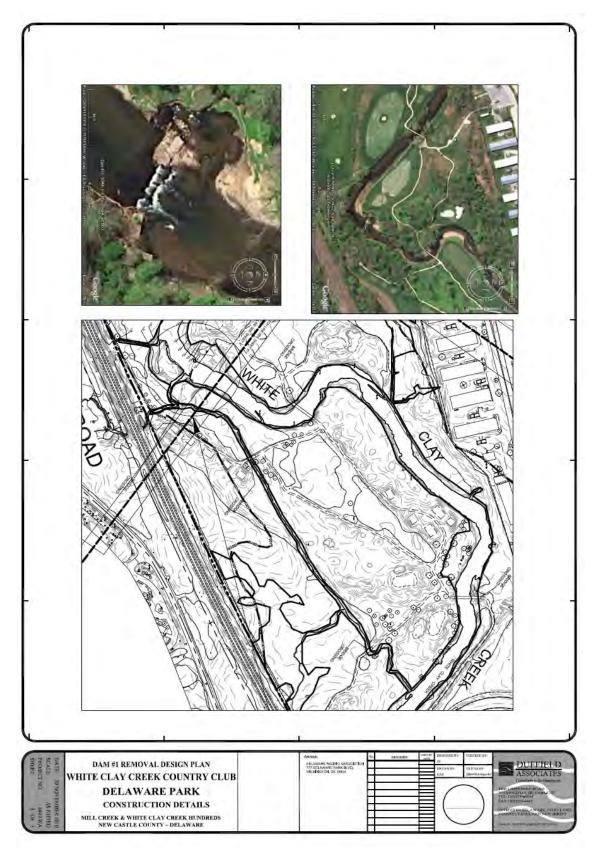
Dam No. 1 Removal design plan and construction details at Delaware Park
